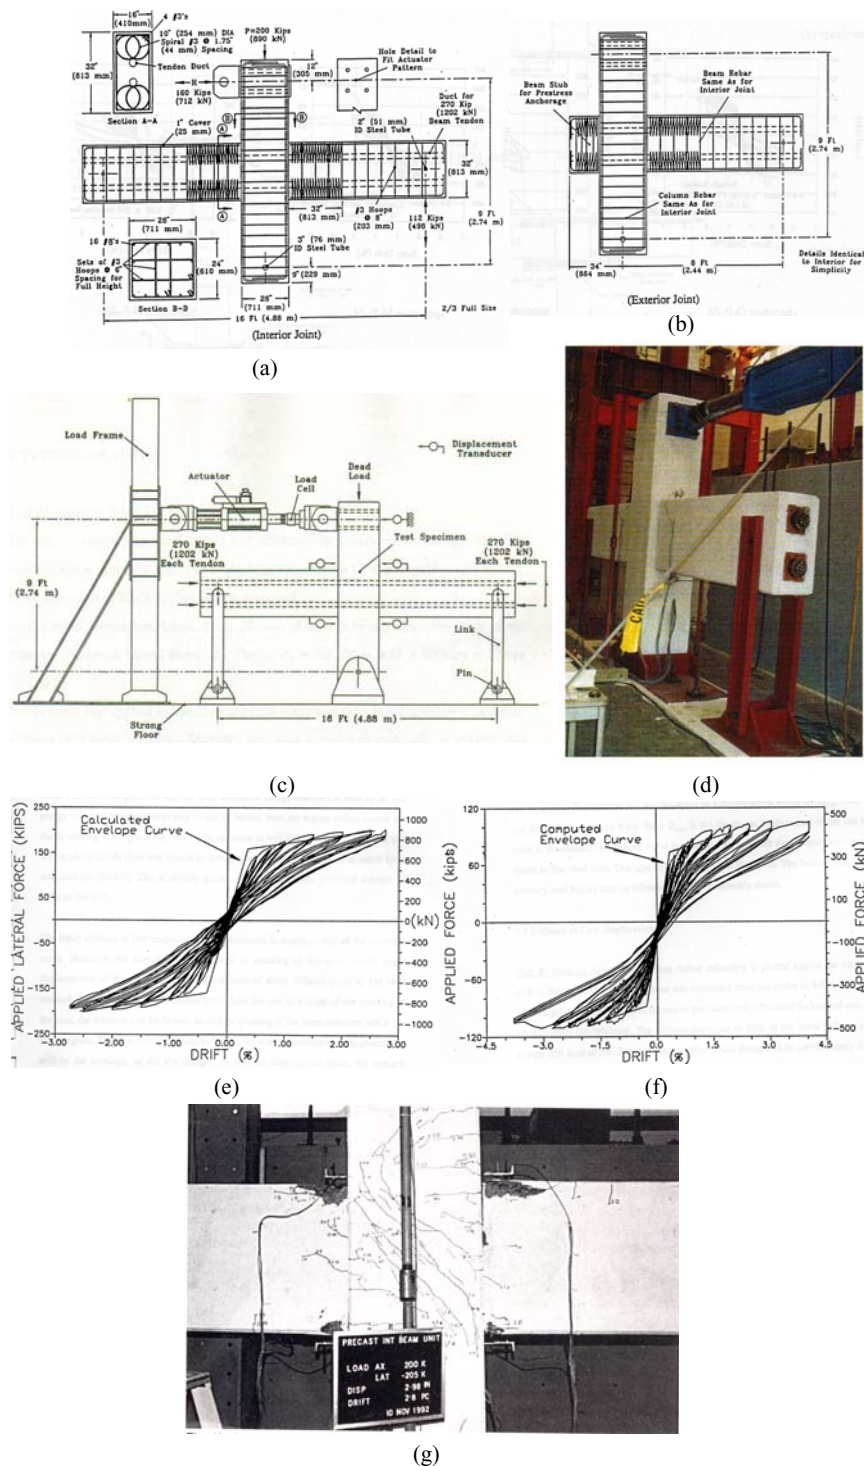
Unbonded post-tensioned precast beam-column subassemblages (from Priestley and MacRae 1996): (a) interior joint specimen; (b) exterior joint specimen; (c) test setup; (d) photograph of test setup; (e) interior joint behavior; (f) exterior joint behavior; (g) photograph of interior joint
